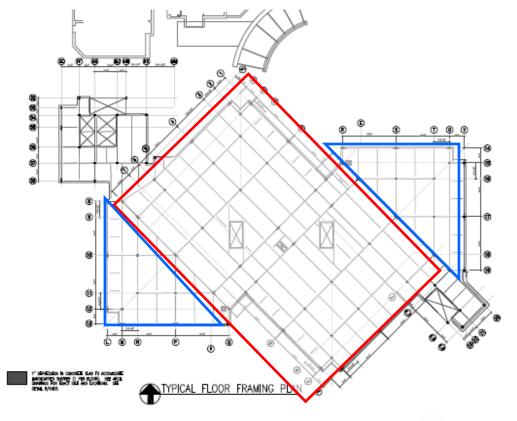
Framing Sections (Floor in Red, Wings in Blue)
